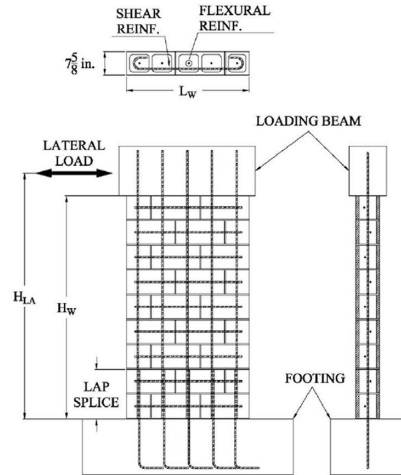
Test setup and reinforcement details of wall specimen UT-PBS-02 (Ahmadi 2012).
